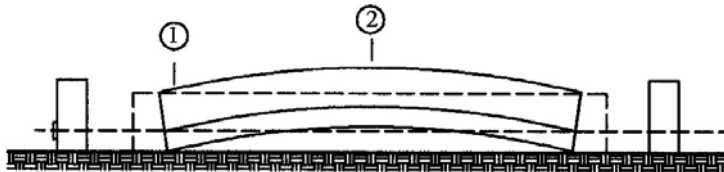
(PCI Fig. 8.2.1.1-1) Loading Stages of a Precast Prestressed Concrete Bridge Beam
